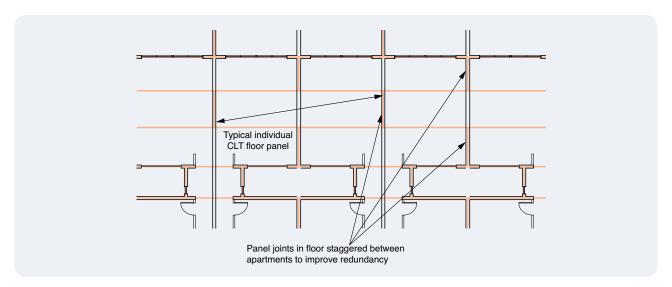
Staggering floor joists in CLT buildings is good practice for robustness. (from WoodSolutions Technical Design Guide #39 Robustness in Structures)
